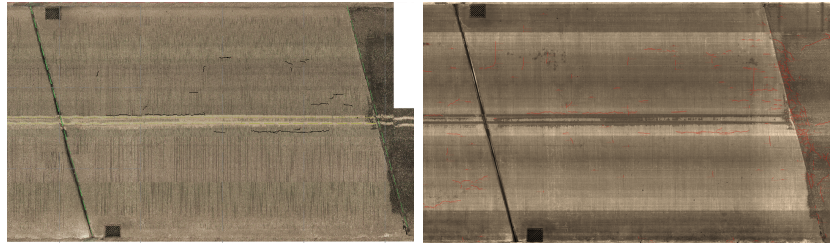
Existing Cracks of Bridge Deck No. 22387-Span 5
